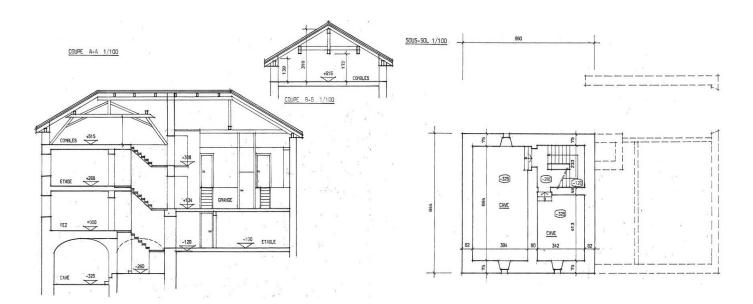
Appendix – Cross section views (left) and Architectural plans of Floor -1 (right)
